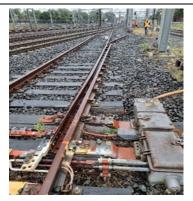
Lookout view at 63B points. Watching rail traffic approach from the Country direction.
